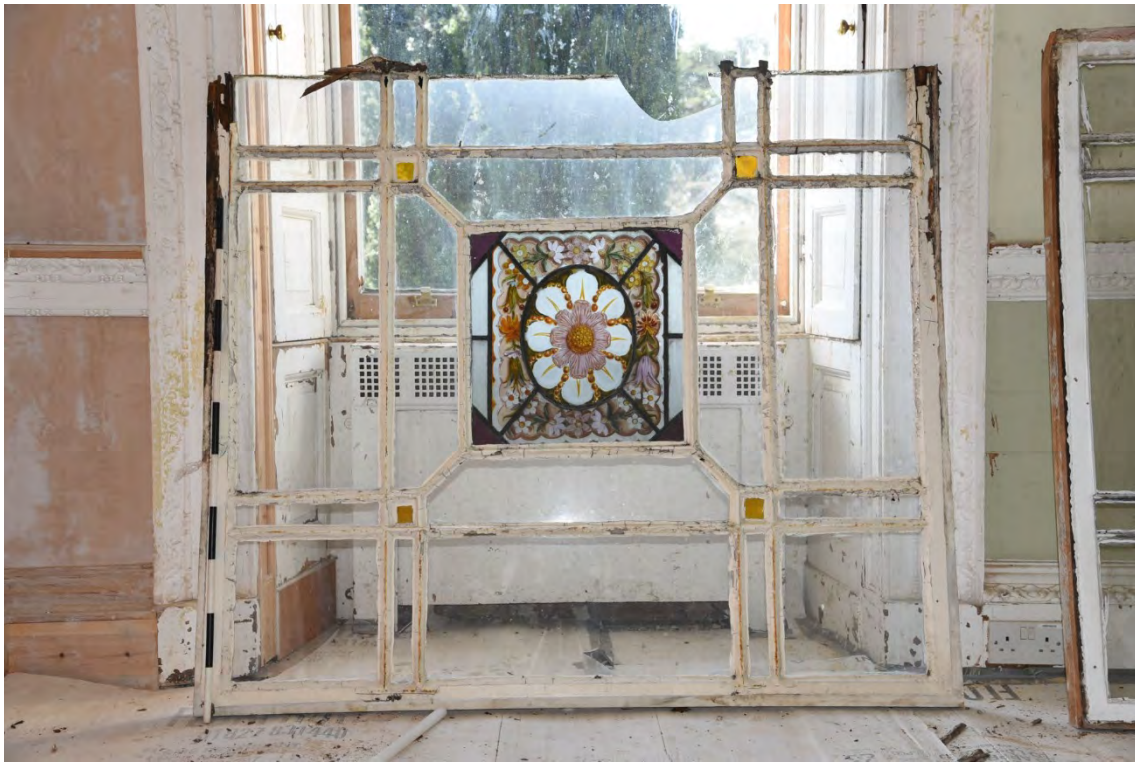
Window panel removed from the lantern's E elevation, exterior view (BRH177)
